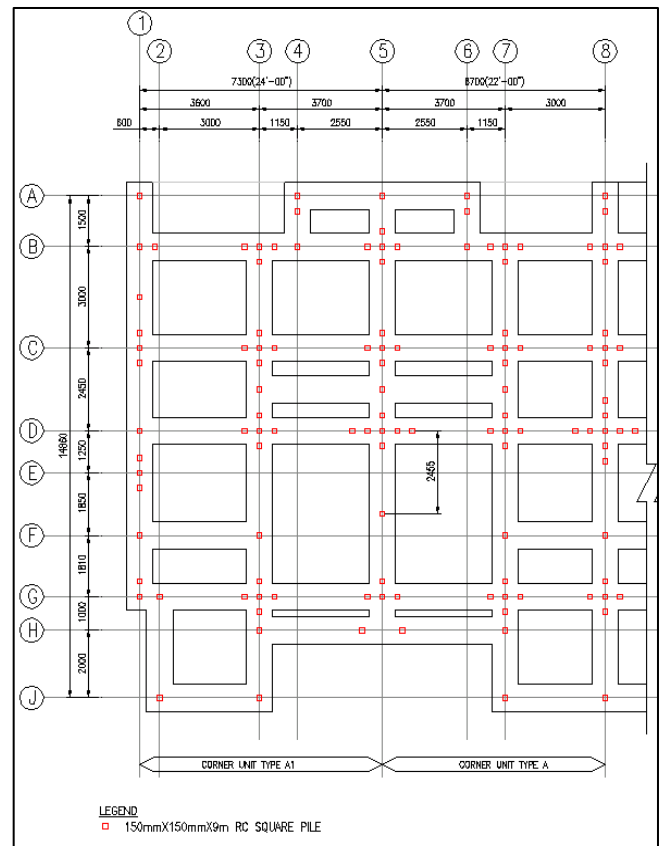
Typical layout of foundation system for terrace houses. (Tan, et al. 2004(b))
